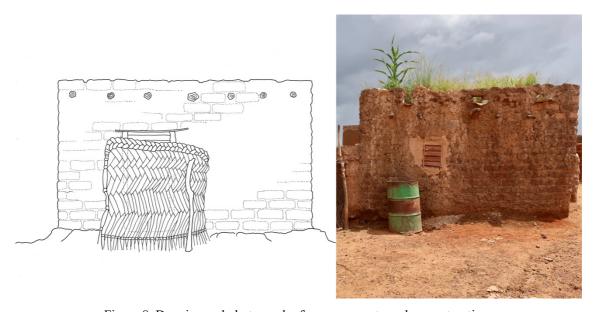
Drawing and photograph of a rogo or rectangular construction.
